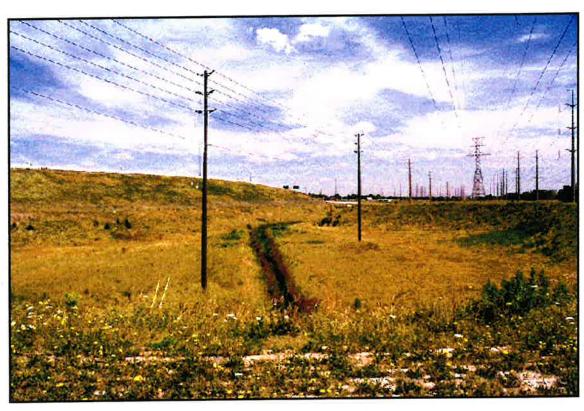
Looking upstream at the Freeman Pond System from the berm at the outlet.
